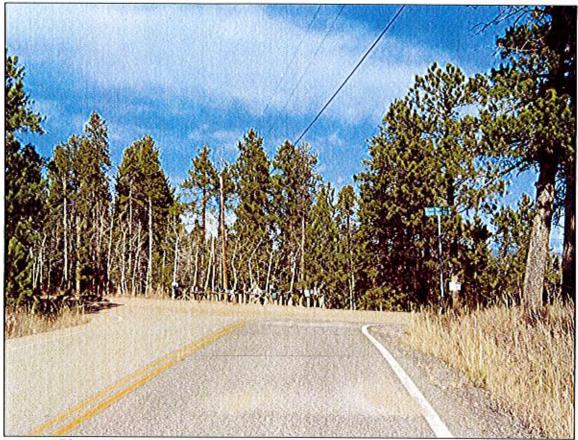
MP 1.0 Crescent Park Drive & Gross Dam Road intersection
